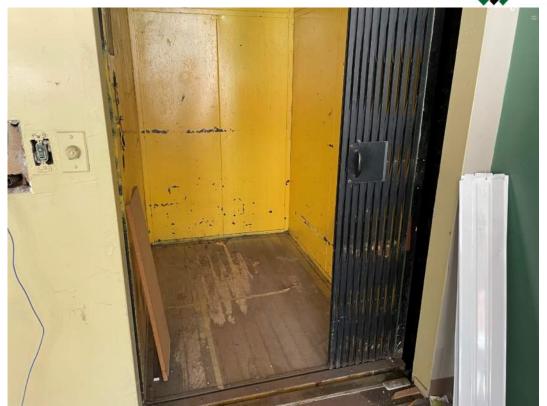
Existing freight elevator, would require significant upgrades or replacement if a significant renovation were to occur.
